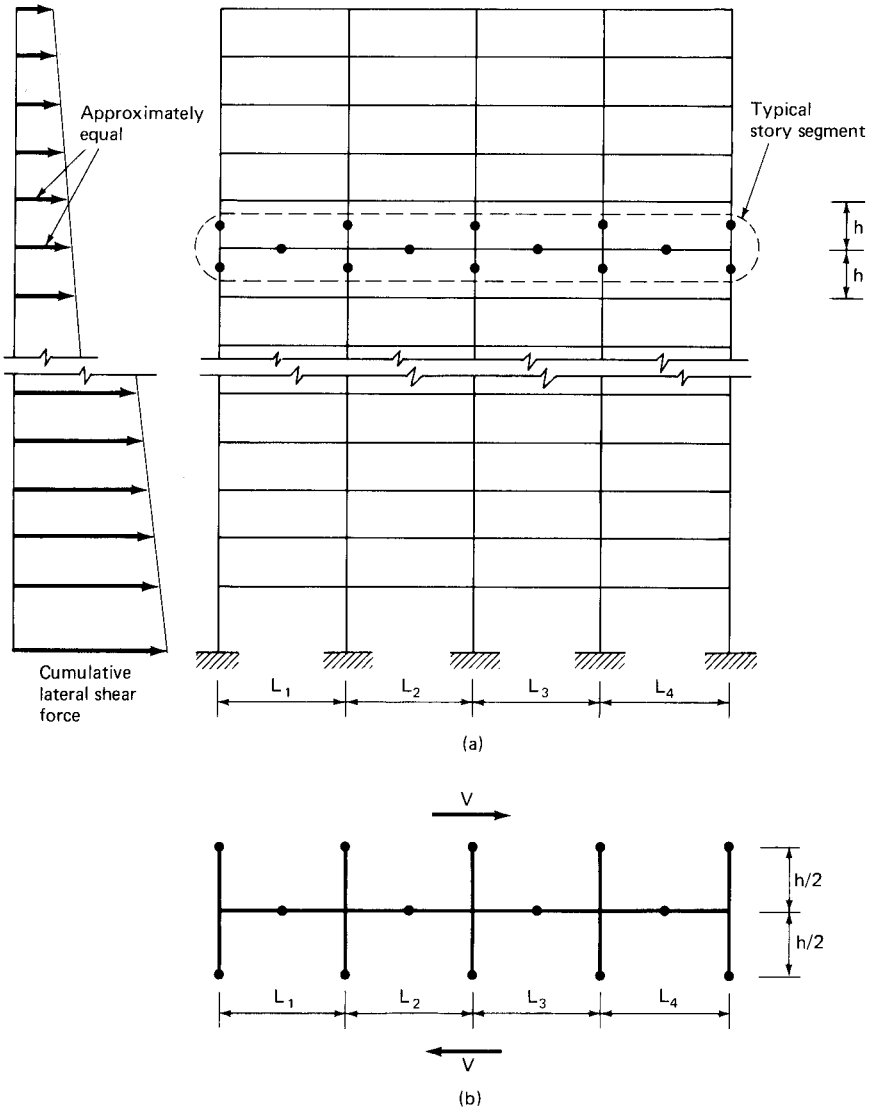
Deflection of portal frame. (a) Frame subjected to lateral loads; (b) typical story segment.
